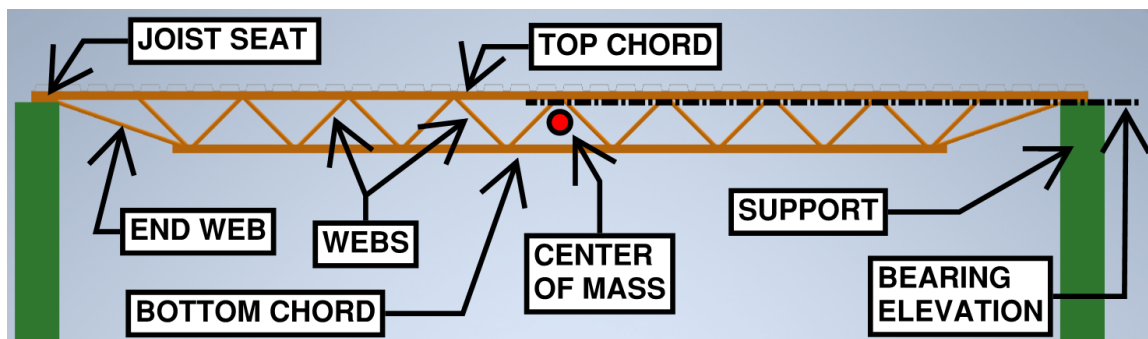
Underslung Steel Joist With Center of Mass Below Bearing Elevation
